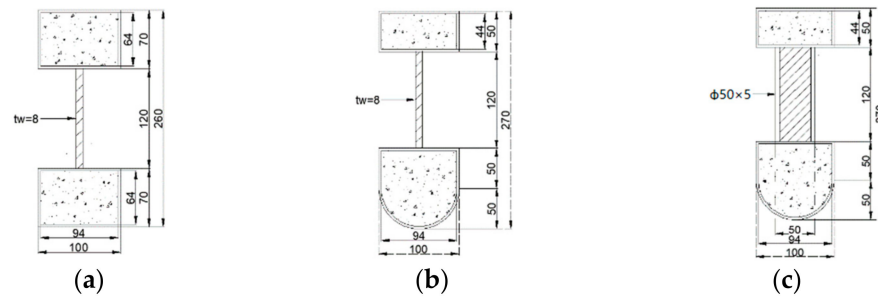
The section of column member (mm). (a) Tubular flange column; (b) Special-shaped tube flange column I; (c) Special-shaped tube flange column II.
